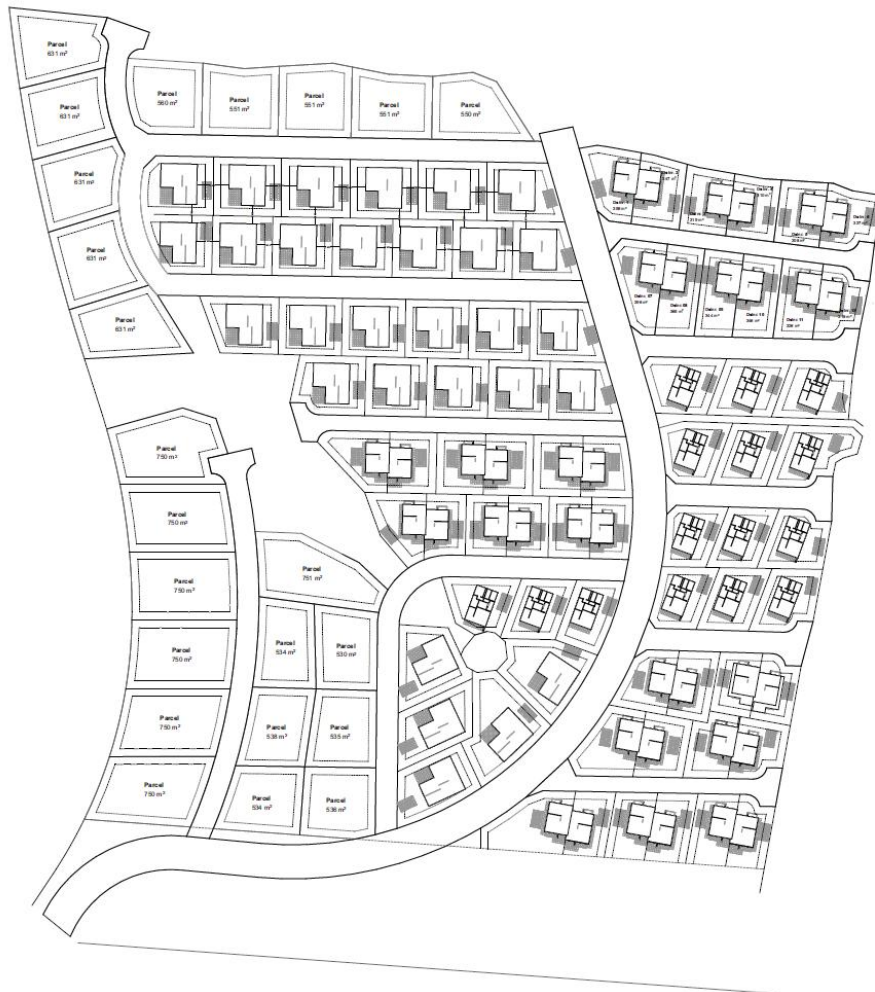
Draft building plan for Teglbakken. Source: Home Deluxe A/S (original developer).
